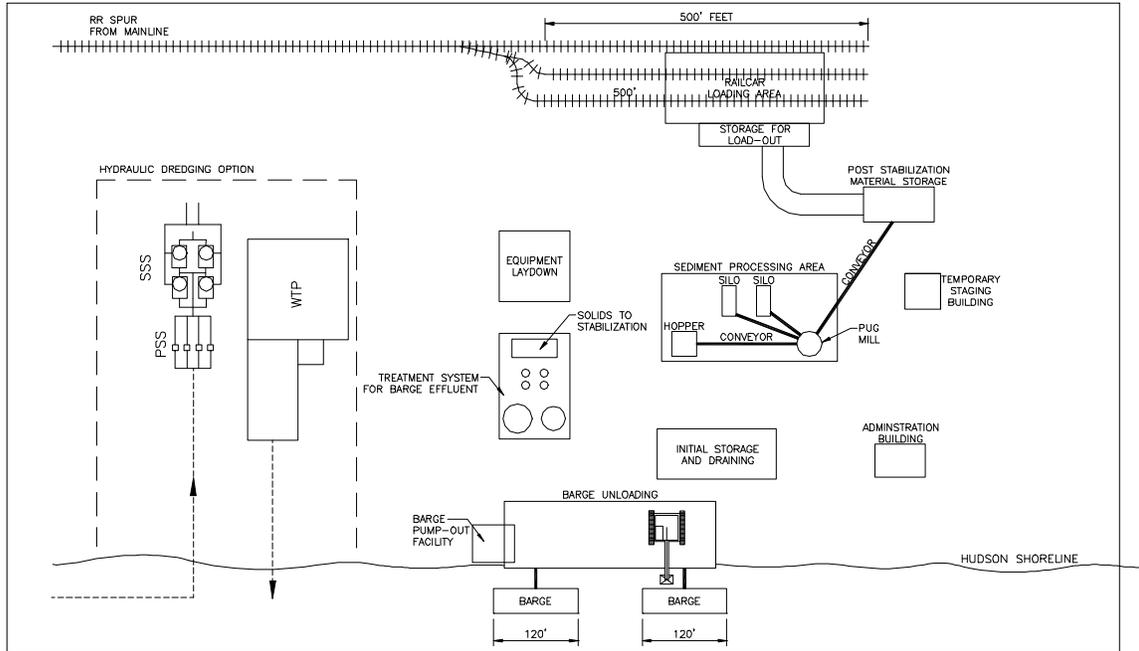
, NORTHERN PROCESSING SITE (NPS) - CONCEPTUAL LAYOUT
